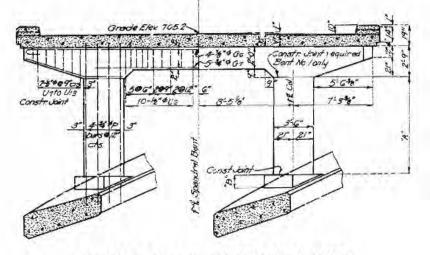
Spring Valley Bridge (J0420) Typical Section through Arch Span
